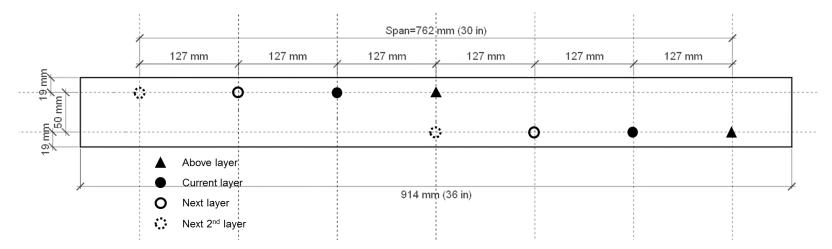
NLT bending-shear test specimen: nail locations top view
